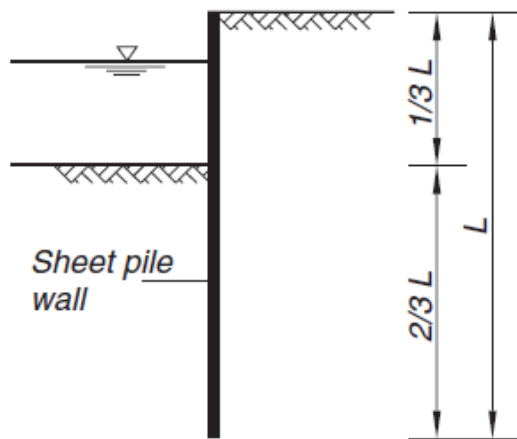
Basic sheet pile wall example (de Gijt & Broeken, 2013).
